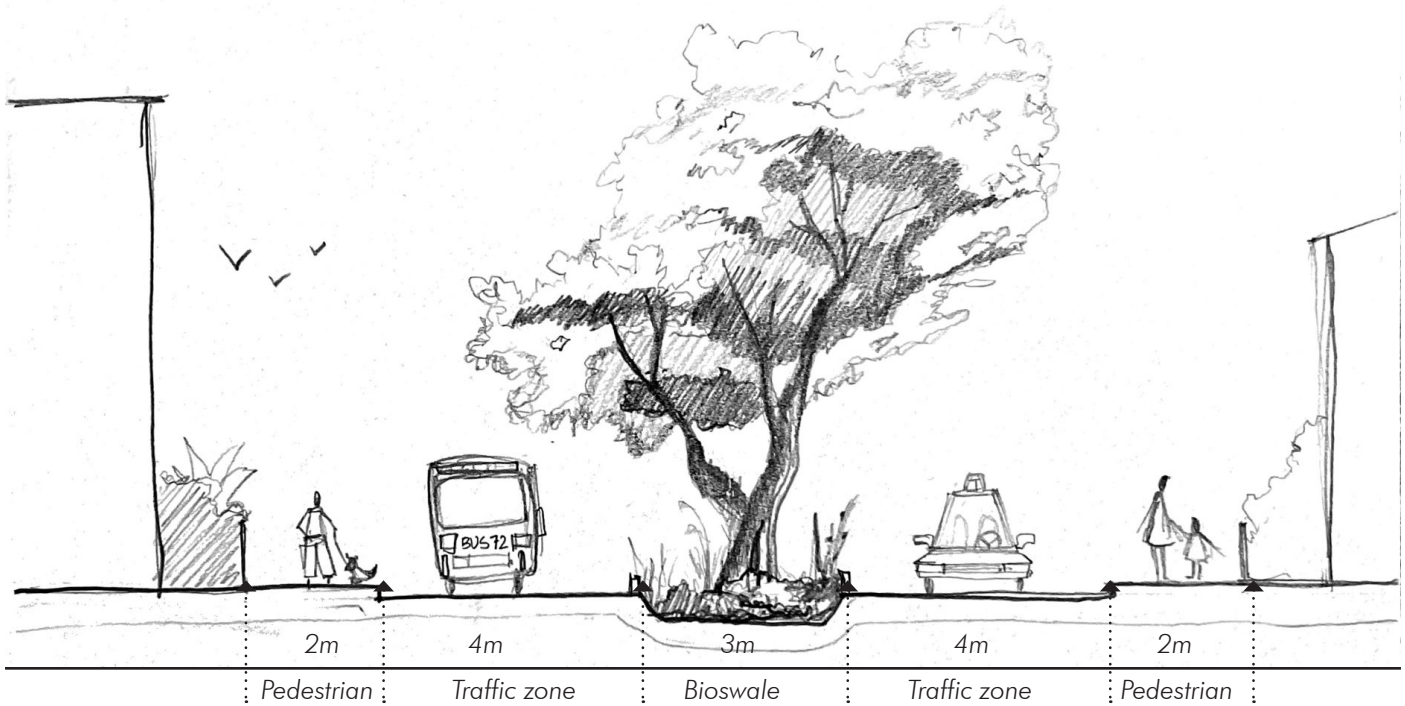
Street F section of a typical 12m wide road with a bio-retention area acting as a median between two lanes of traffic.
